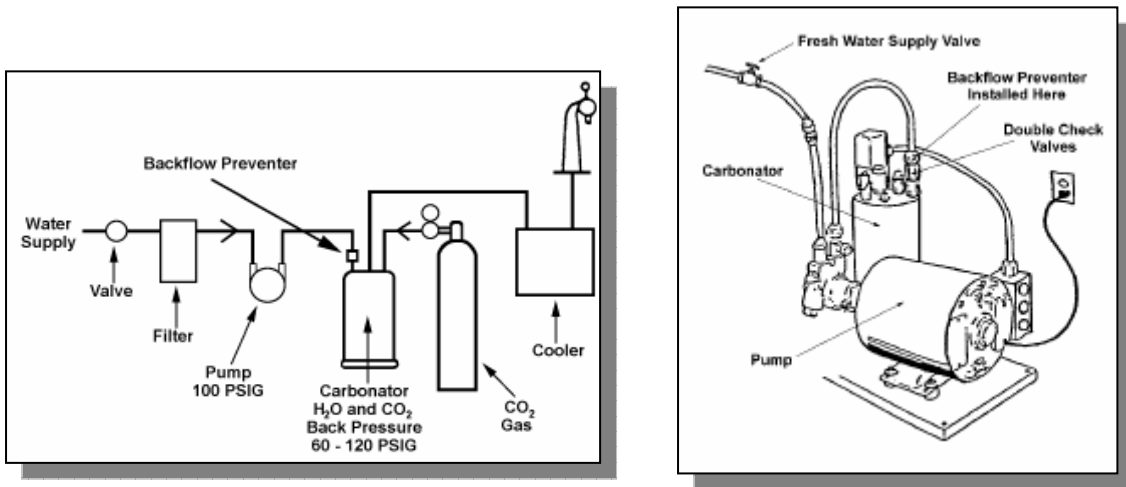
Beverage machine carbonators' backflow preventer installation position
